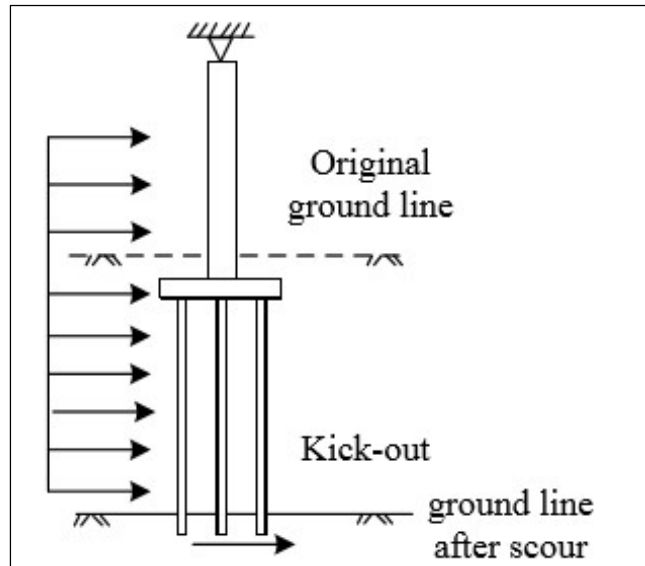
Kick out of foundations (After Lin et al.2010)
